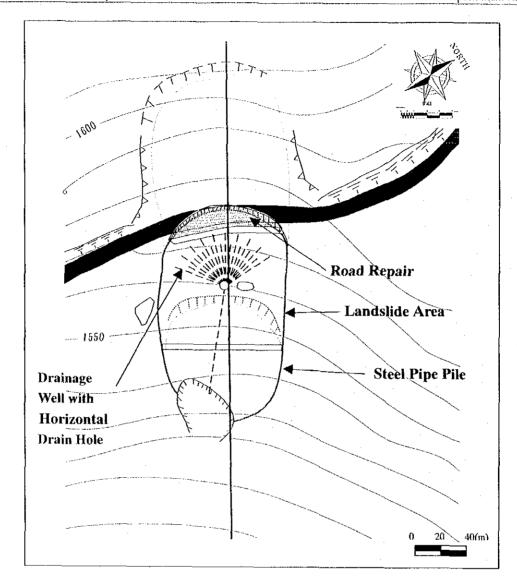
Plan (Steel Pipe Pile and Drainage Well)
